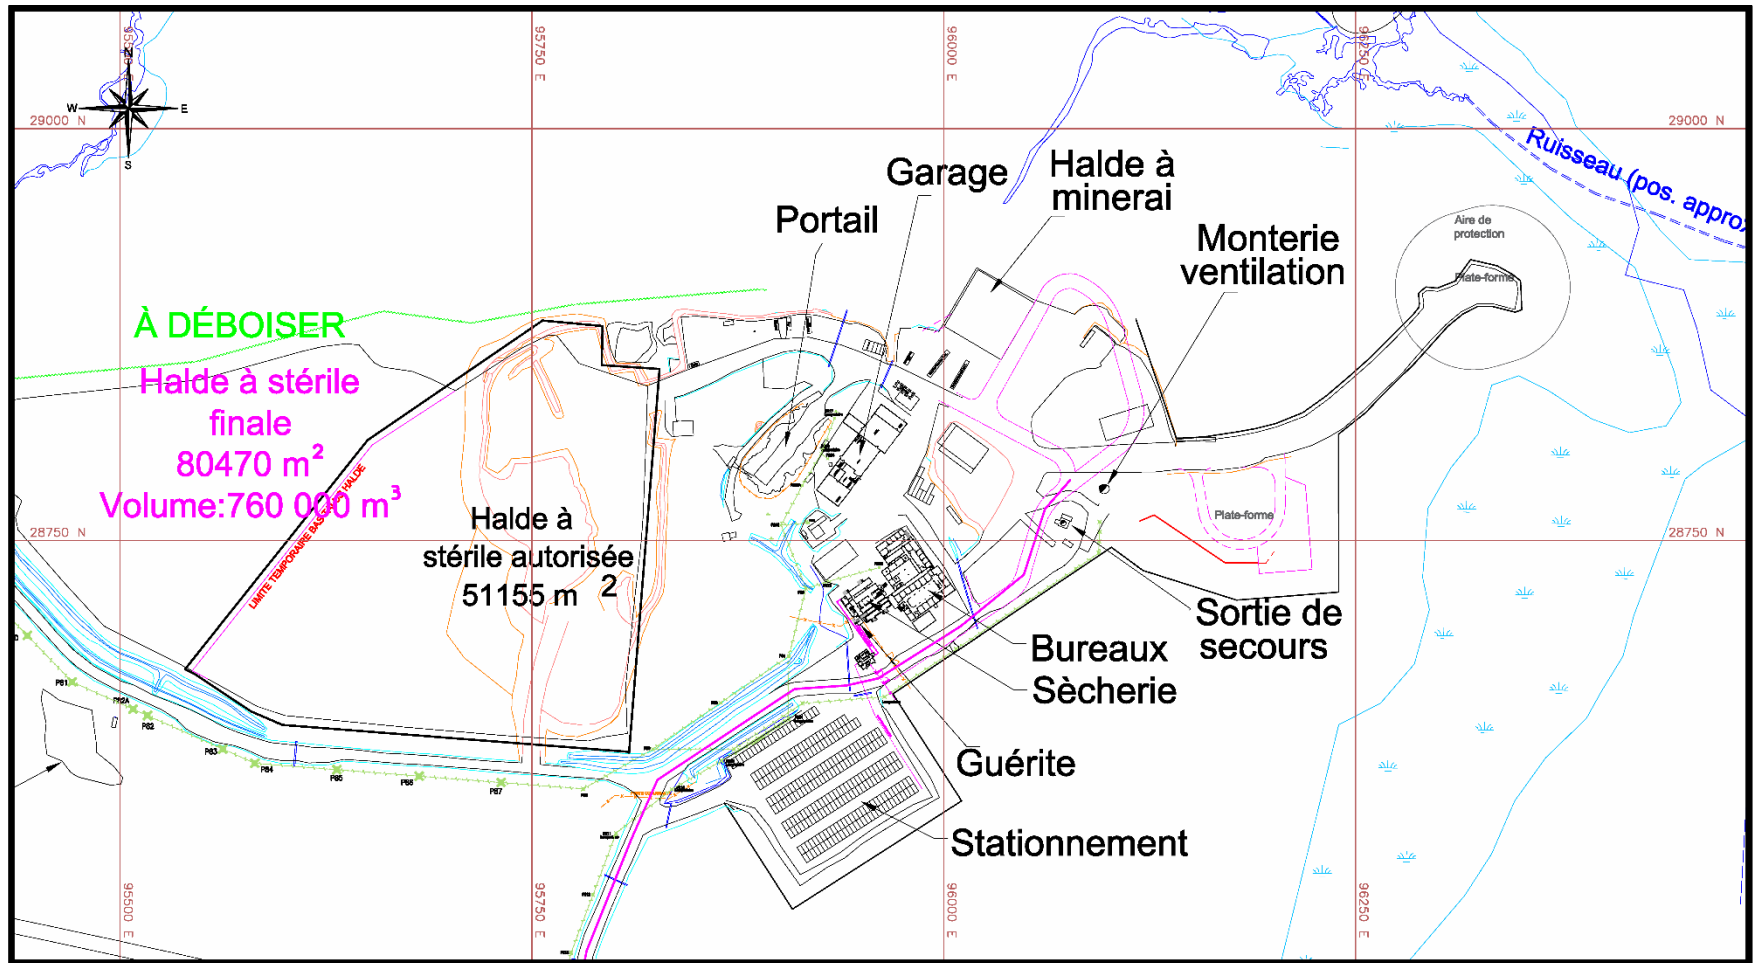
Actual Surface layout of Triangle Mine Site.
